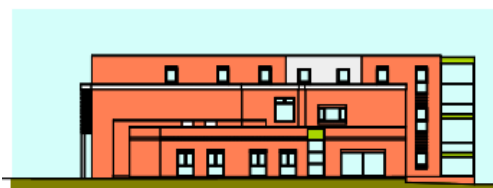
Proposed side elevation (eastern elevation facing onto car park)
